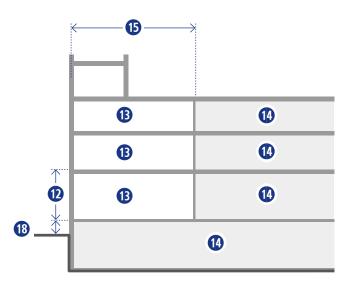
Civic Building: Floor-to-Floor Height & Use Requirements
